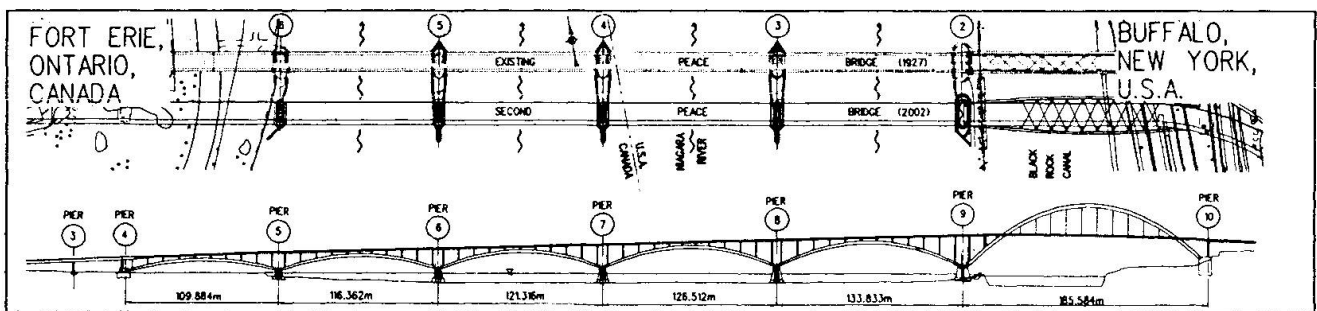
General Arrangement Showing Existing and New (Second) Peace Bridge.
